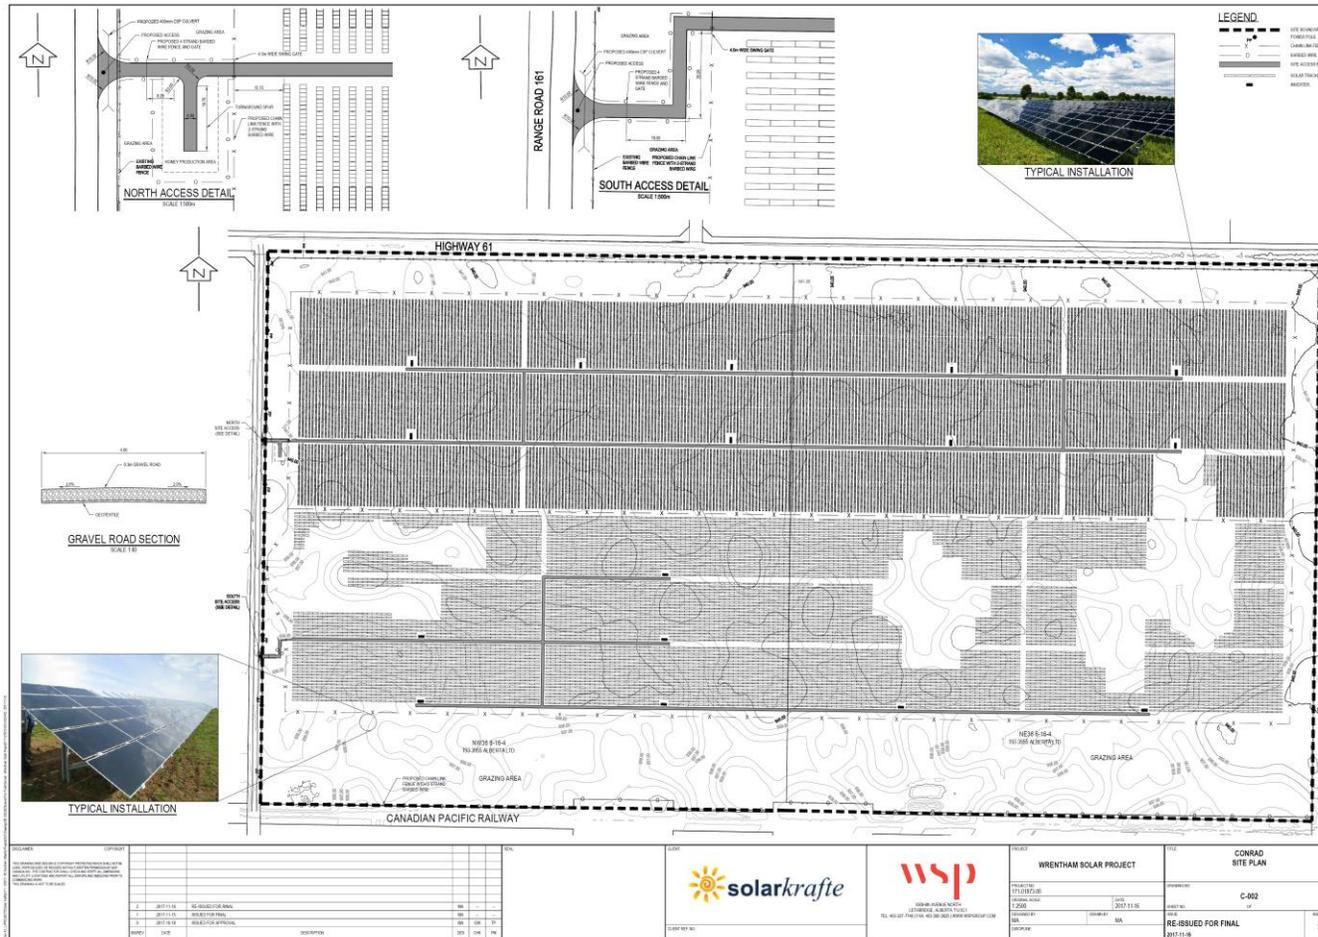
WRENTHAM SOLAR PROJECT SITE PLAN
